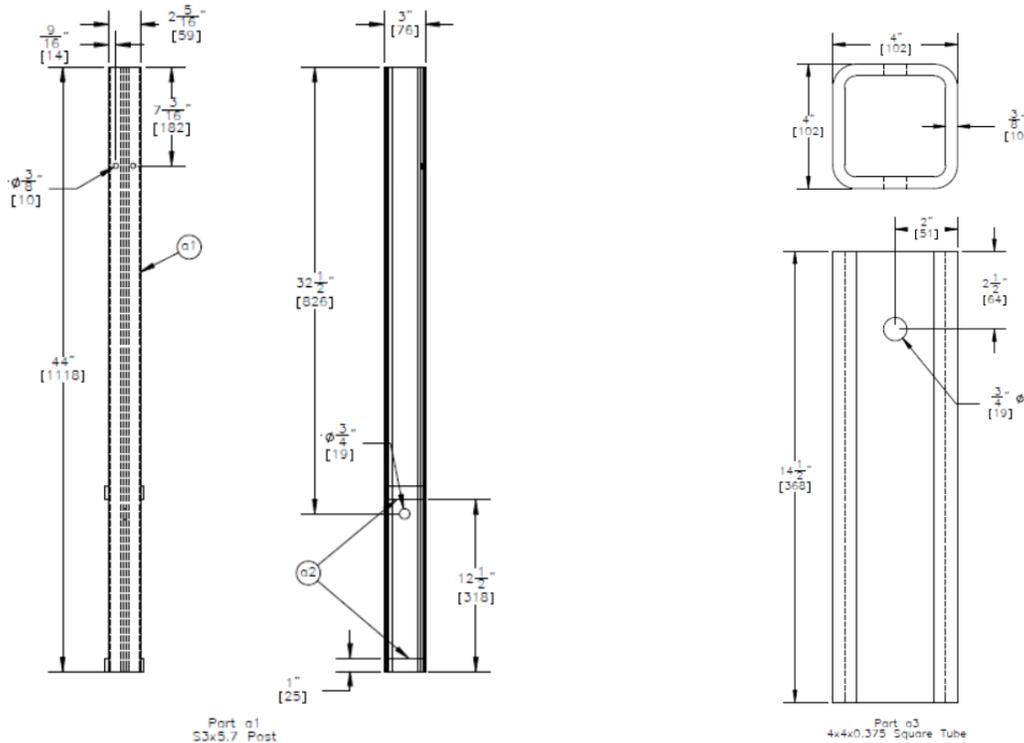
Post Assembly and Socket Tube from the MGS Bridge Rail [3]
